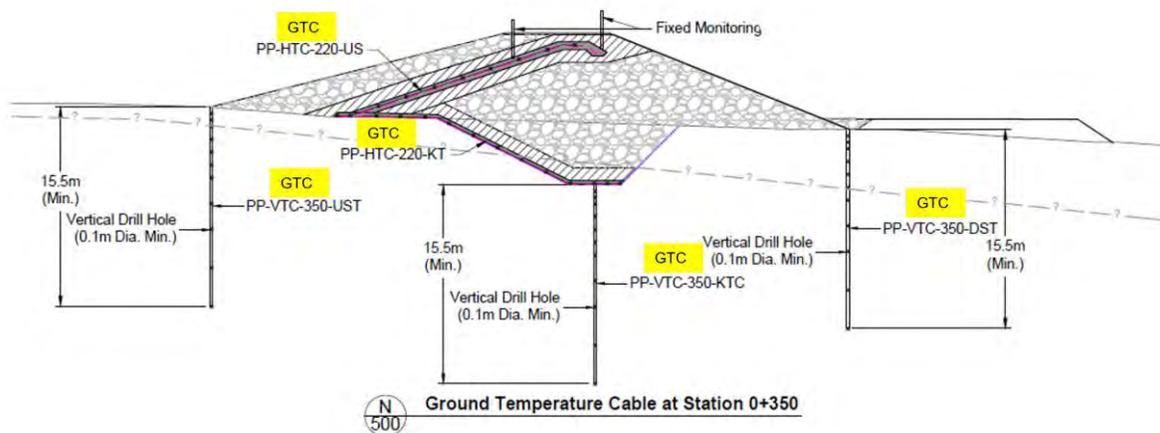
Example Primary Pond Monitoring Cross-Sections
